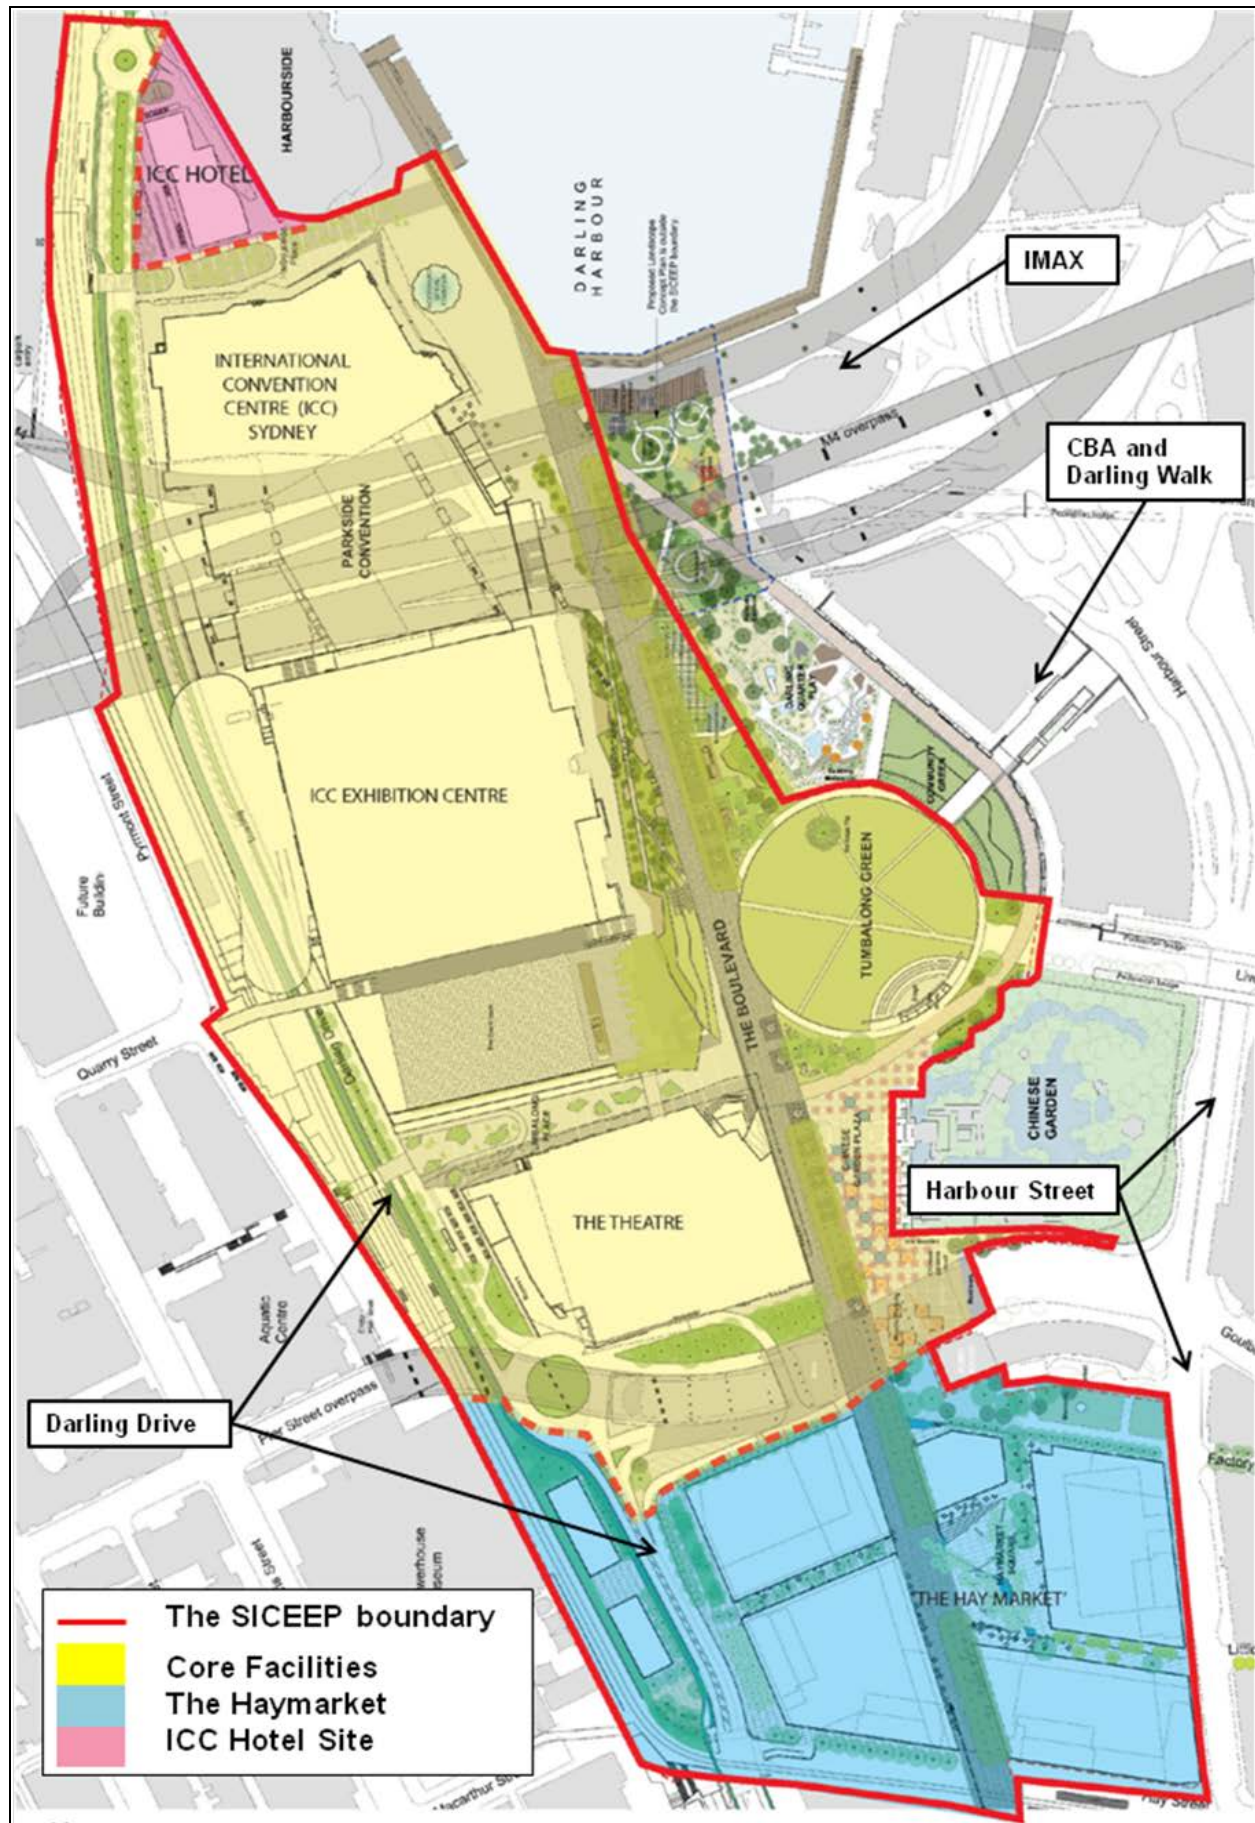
SICEEP Master plan (Source: SSD 5878 DG's report)
